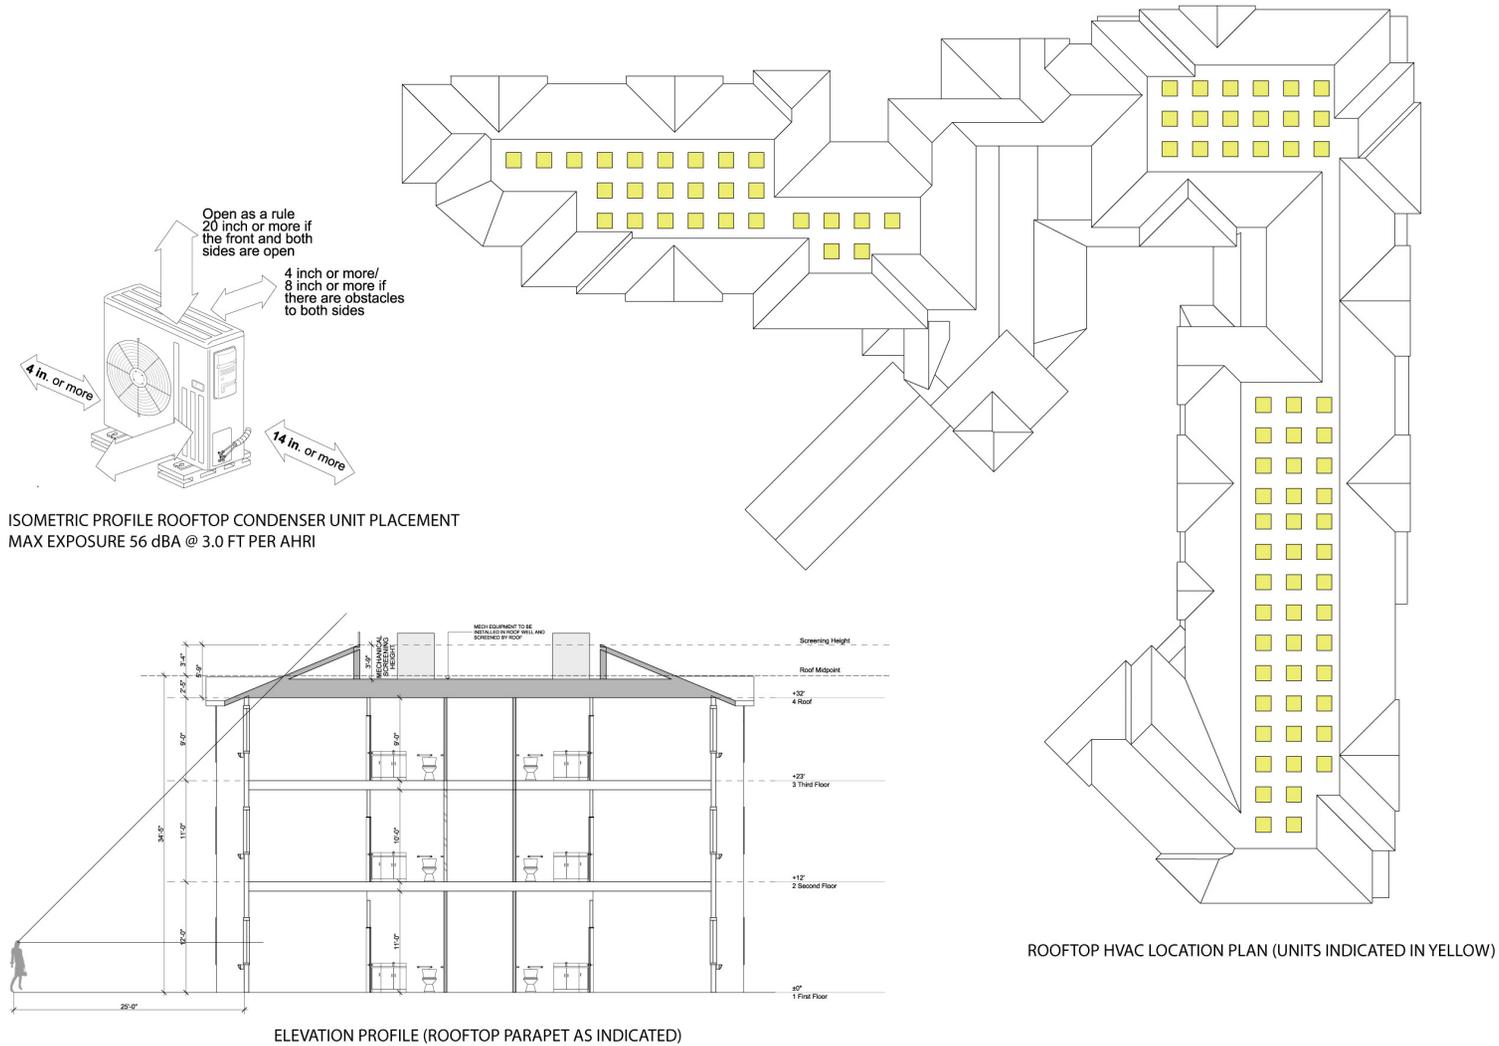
Rooftop Mounted HVAC Unit Locations (Irvin Partners Architects 9/18)
